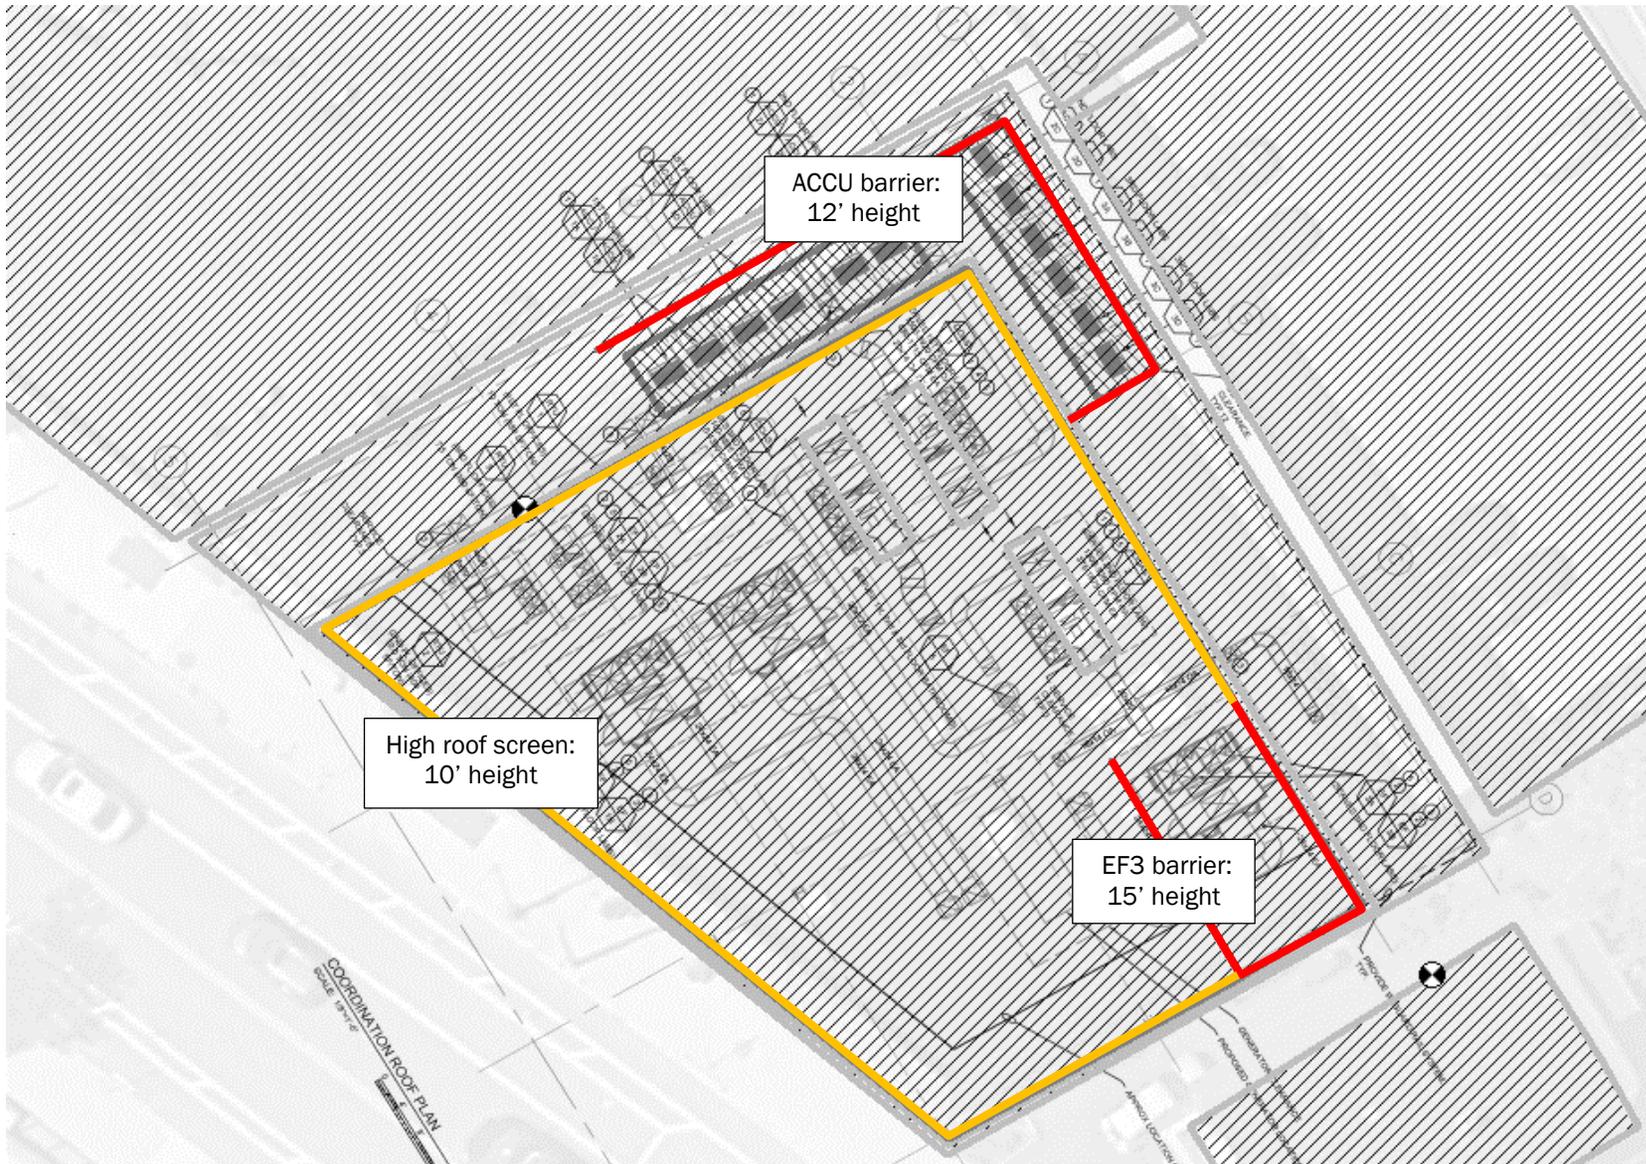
Rooftop barrier configuration (proposed acoustic walls shown in red, architectural roof screen shown in orange)
